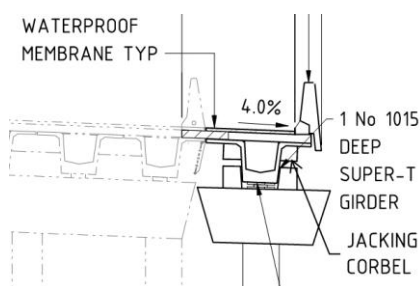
Jacking Corbel at Single Girder Widening (shown for Infra 30.1)
